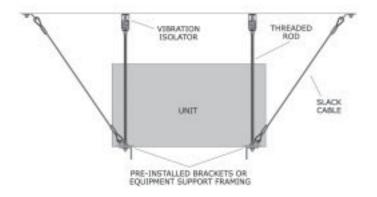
Side view of vibration isolation suspended attachment to the building structure.
